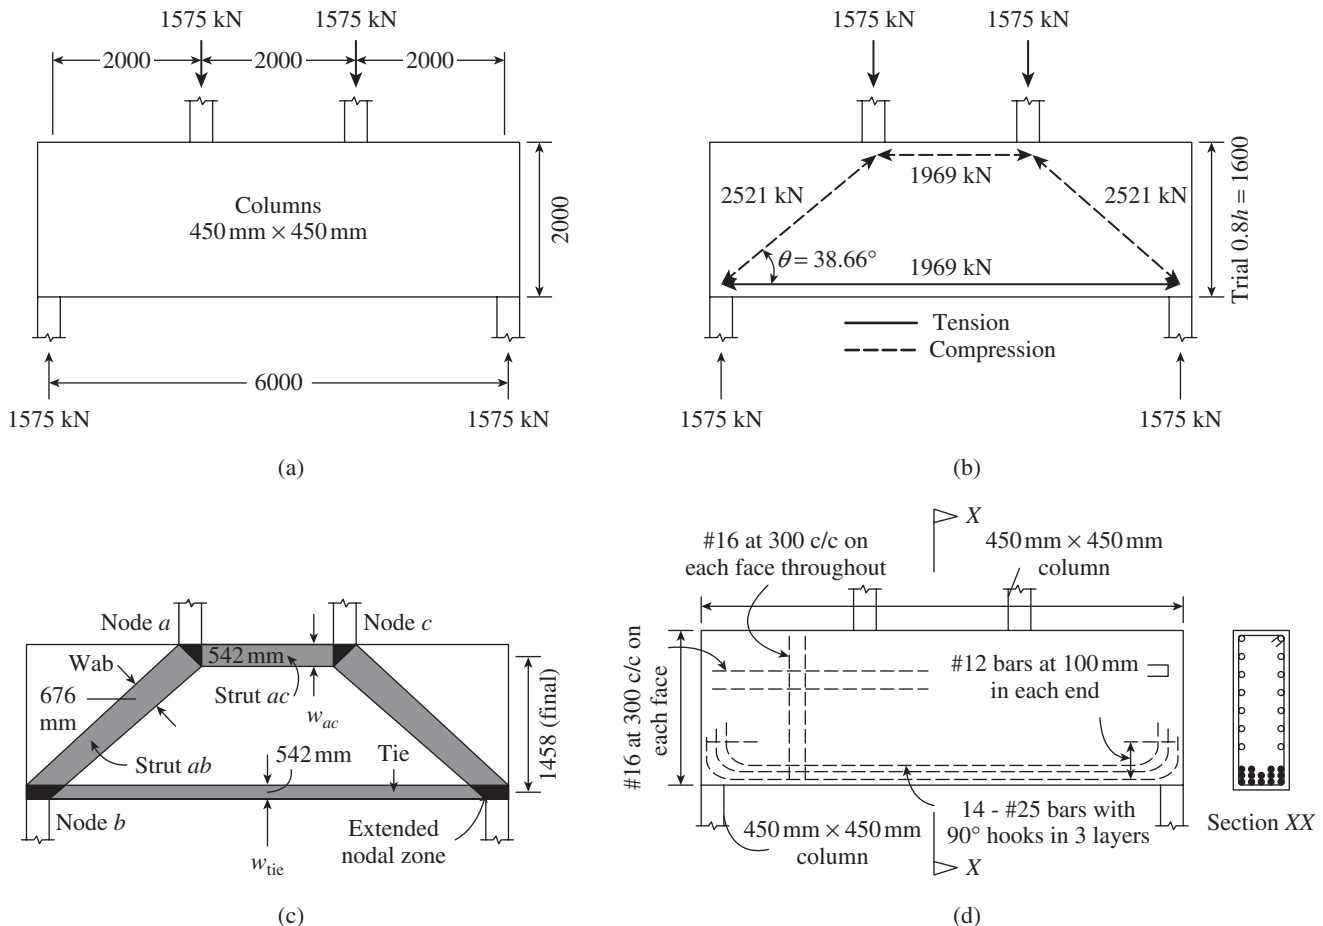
Example design of deep beam (a) Beam dimension and loading (b) Beam internal forces and trial STM (c) Final STM with struts, ties, and nodes (d) Details of reinforcement
